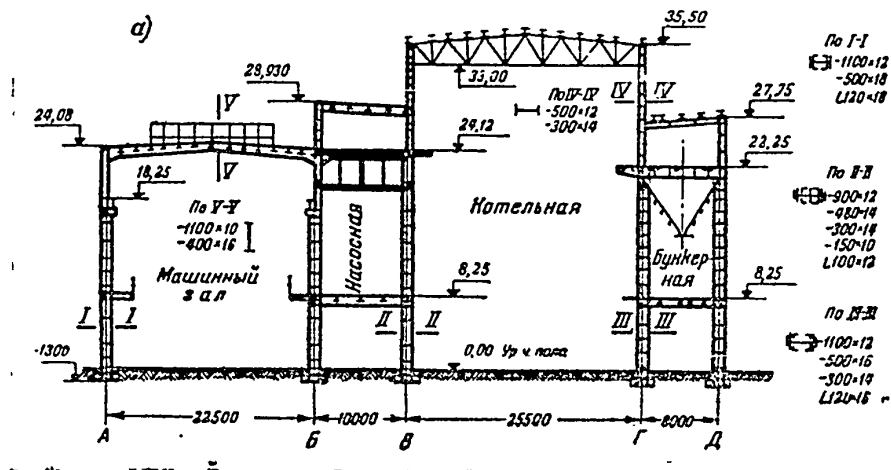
Transverse steel frames of the main power plant building with steel sections for a rigid-frame connection design (as per scheme 1 - fig. 2).
